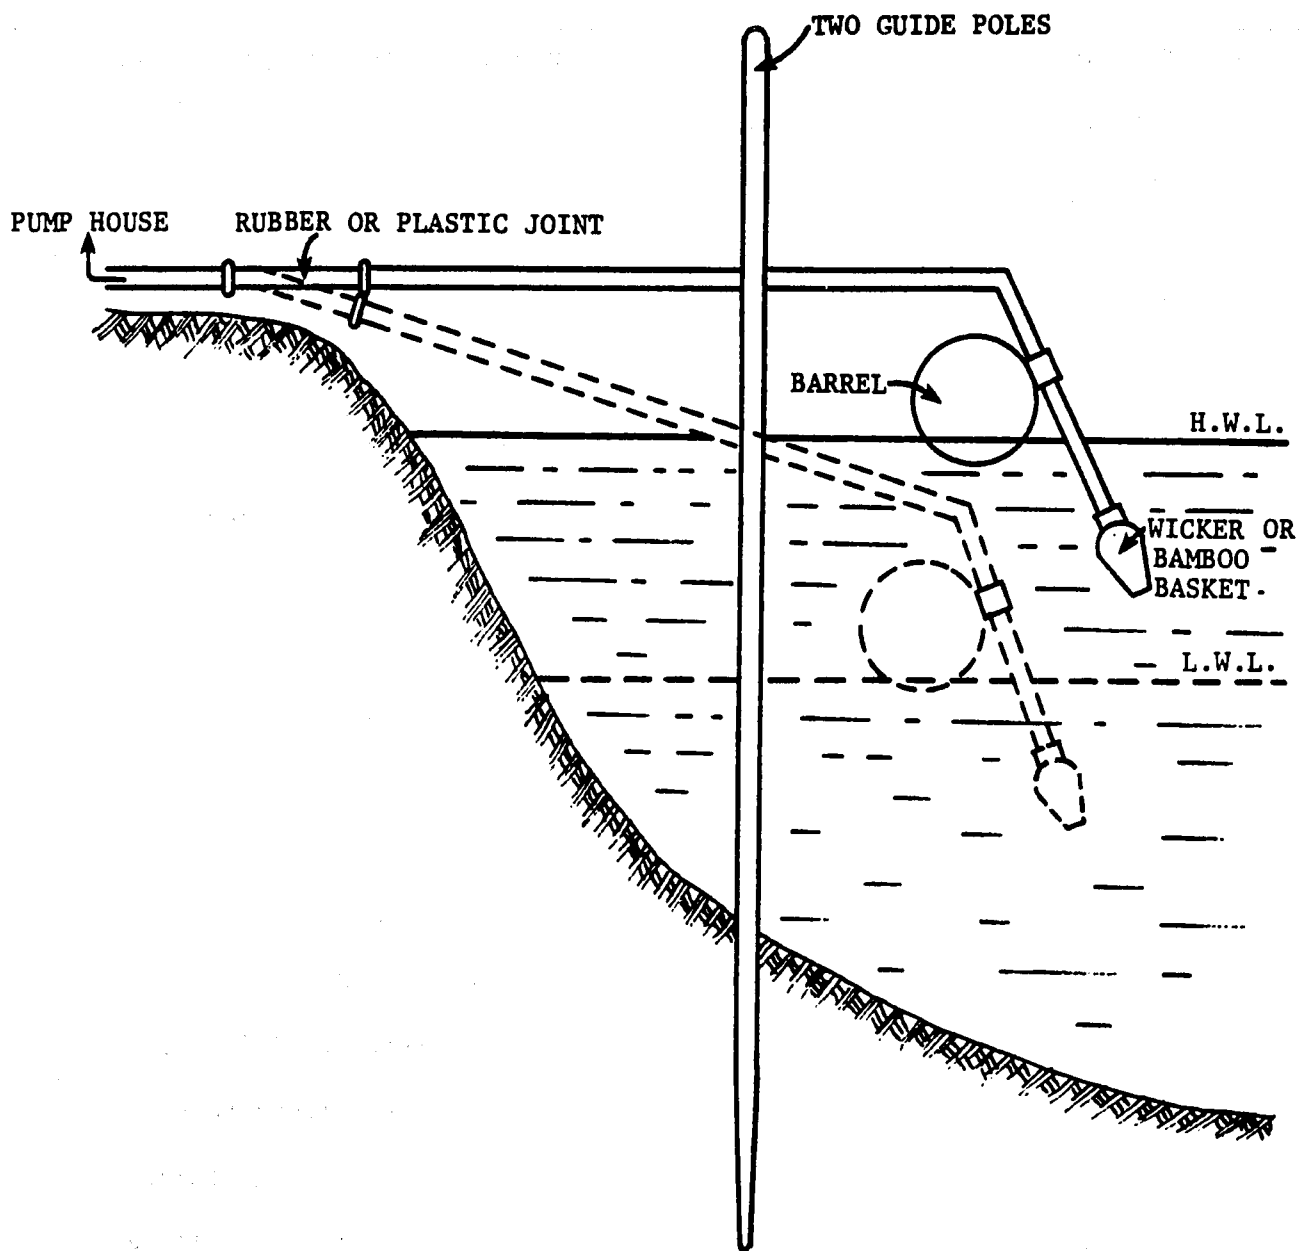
Protected pond or lake water intake (schematic, not to scale).
